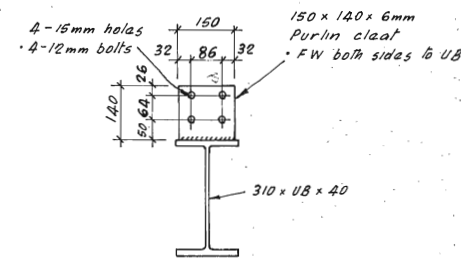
DETAIL OF WELD PLATES ON RAFTERS FRAME 3
